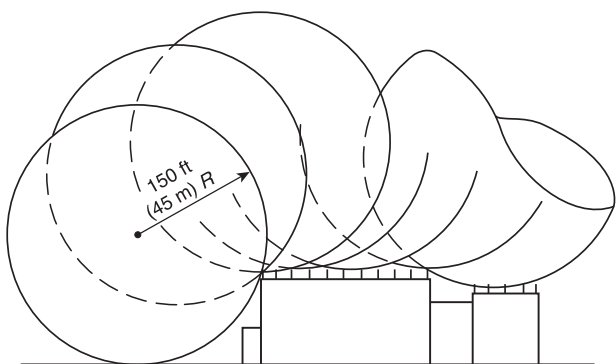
Zone of Protection Depicting Rolling Sphere Method.
